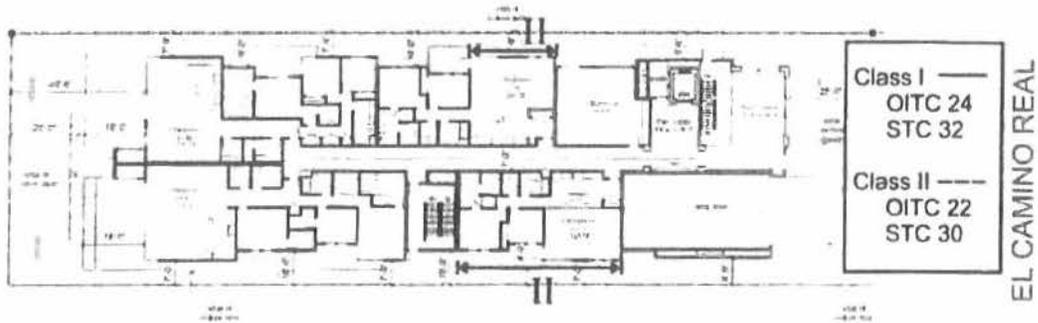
A: *Minimum recommended glazing ratings for Floor 1
